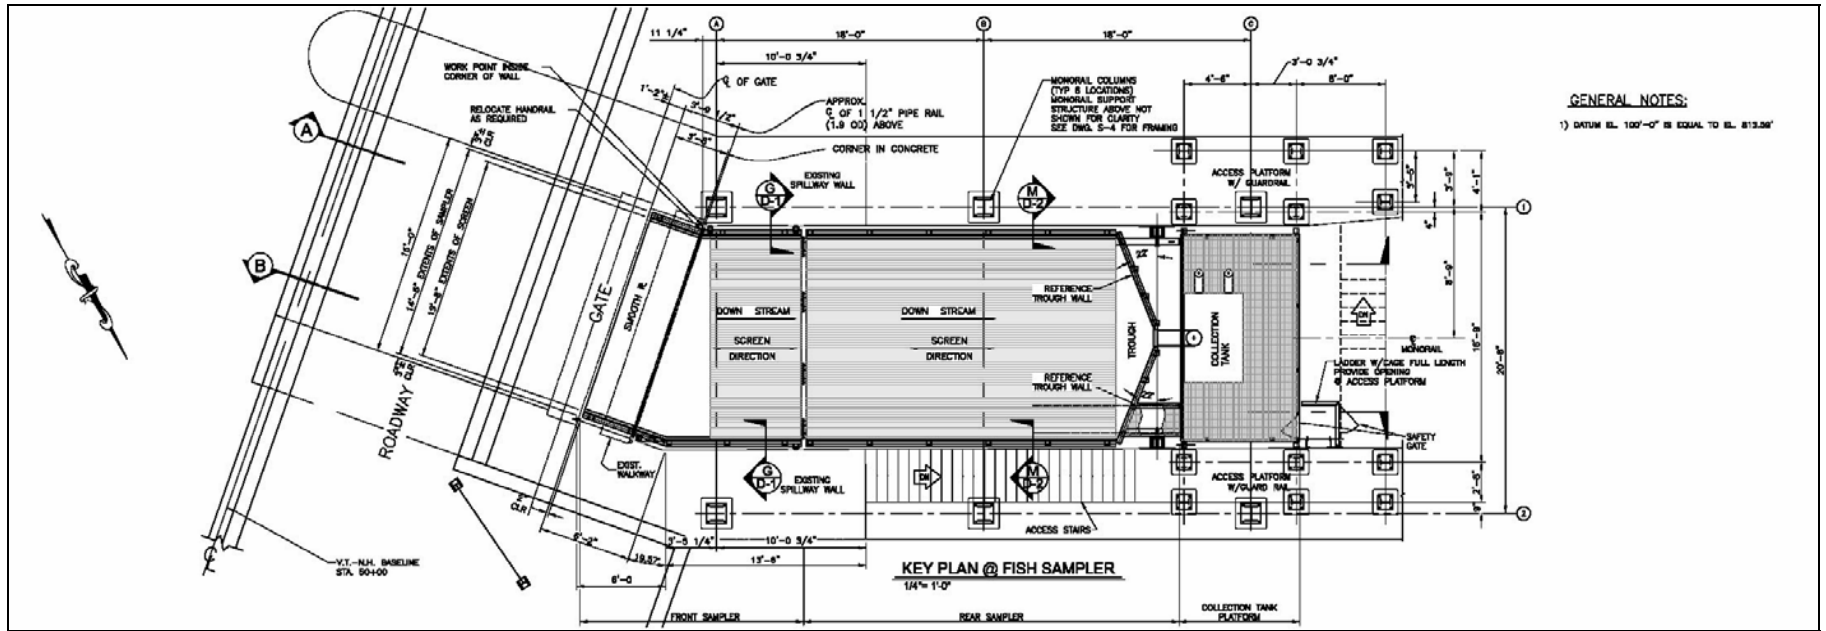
Key plan of USGen NE's Moore Development inclined plane sampler. The plan does not show flow reflectors installed after the sampler was erected. Plan drawing prepared by Kleinschmidt for USGen NE.
